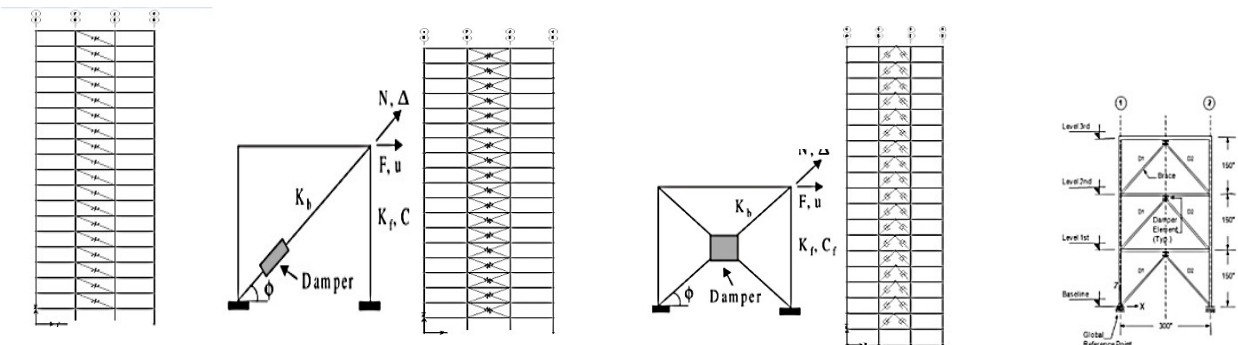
Diagonal dampers, cross dampers and inverted V dampers used for damper configurations.
